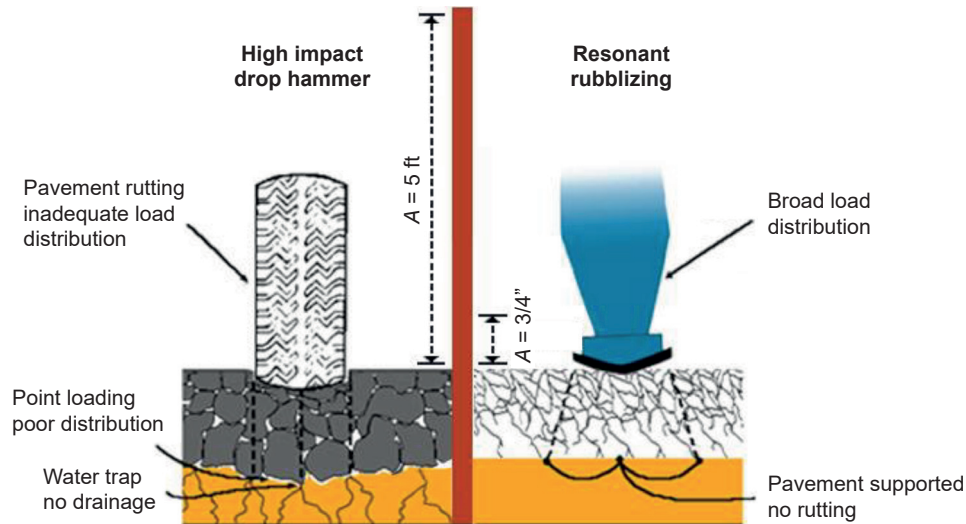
Concrete pavement destressing (breaking) methods 0 [9]
